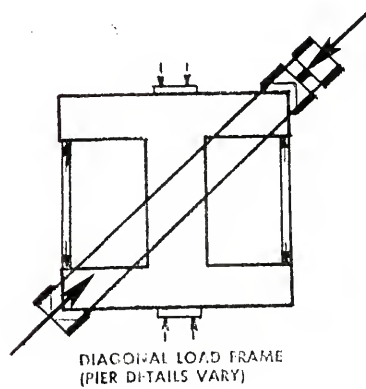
Test setup adopted by Schneider for full scale tests on piers.
